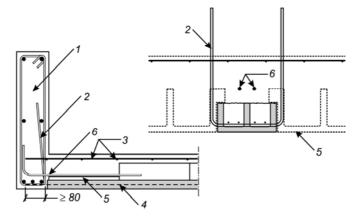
Support from embedded beams – beams with protruding reinforcement (principle)
